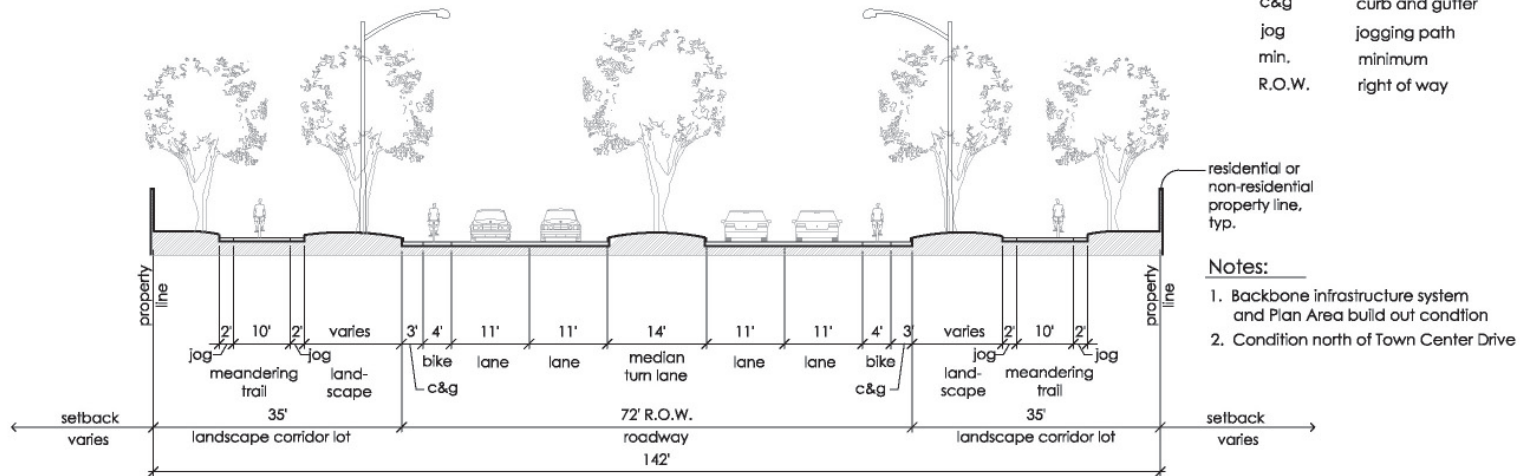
Roadway Sections – Major Arterial Street (16th Street)
